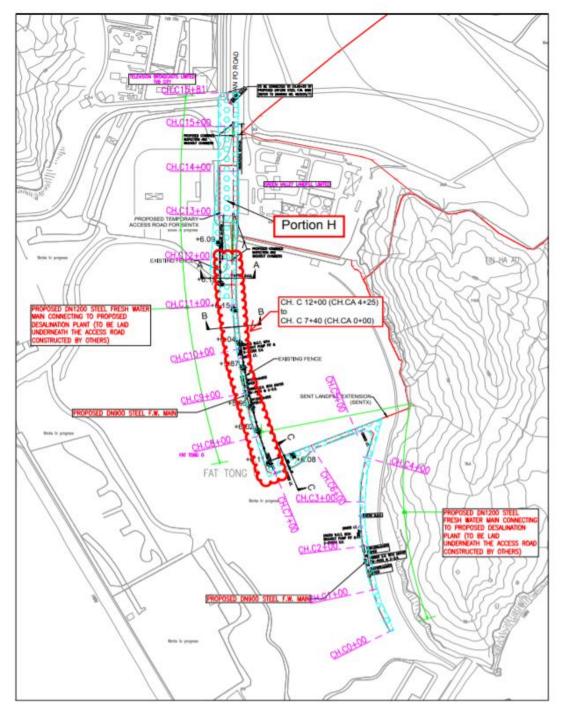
Location Plan for Portion H– CH.C 7+40~CH.C 12+00 (CH.CA 0+00 ~ CH.CA4+25)
